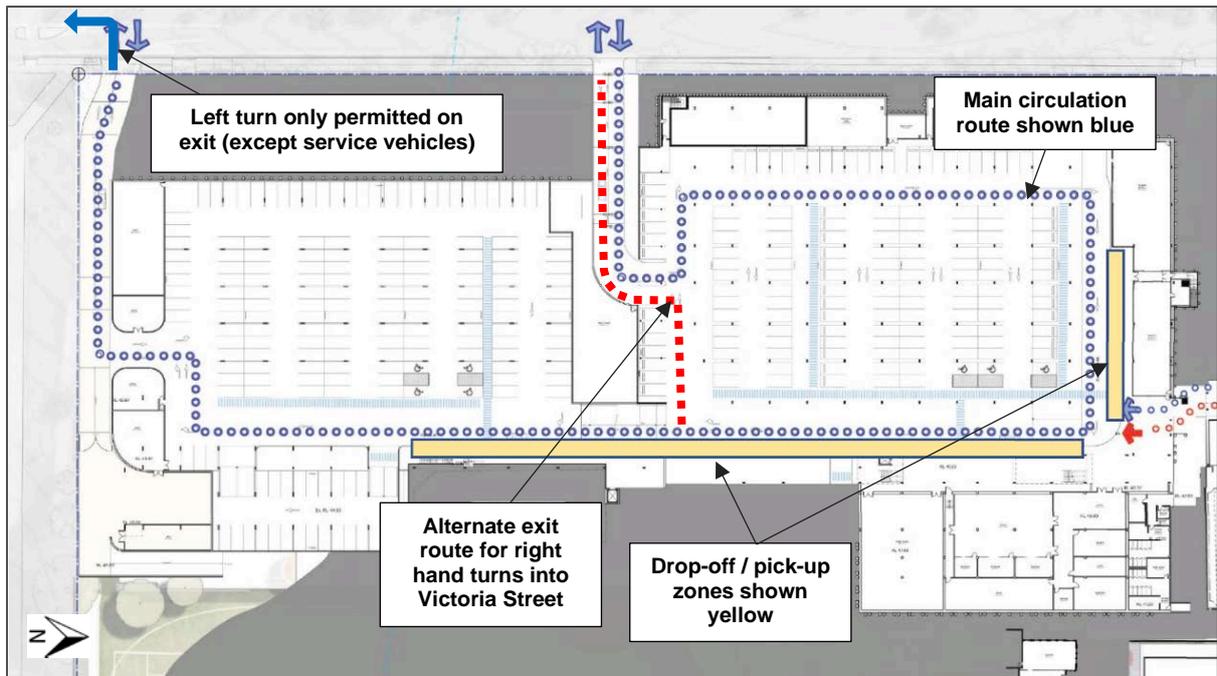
| Proposed car park layout (Source: Applicant's SRtS 2021)
